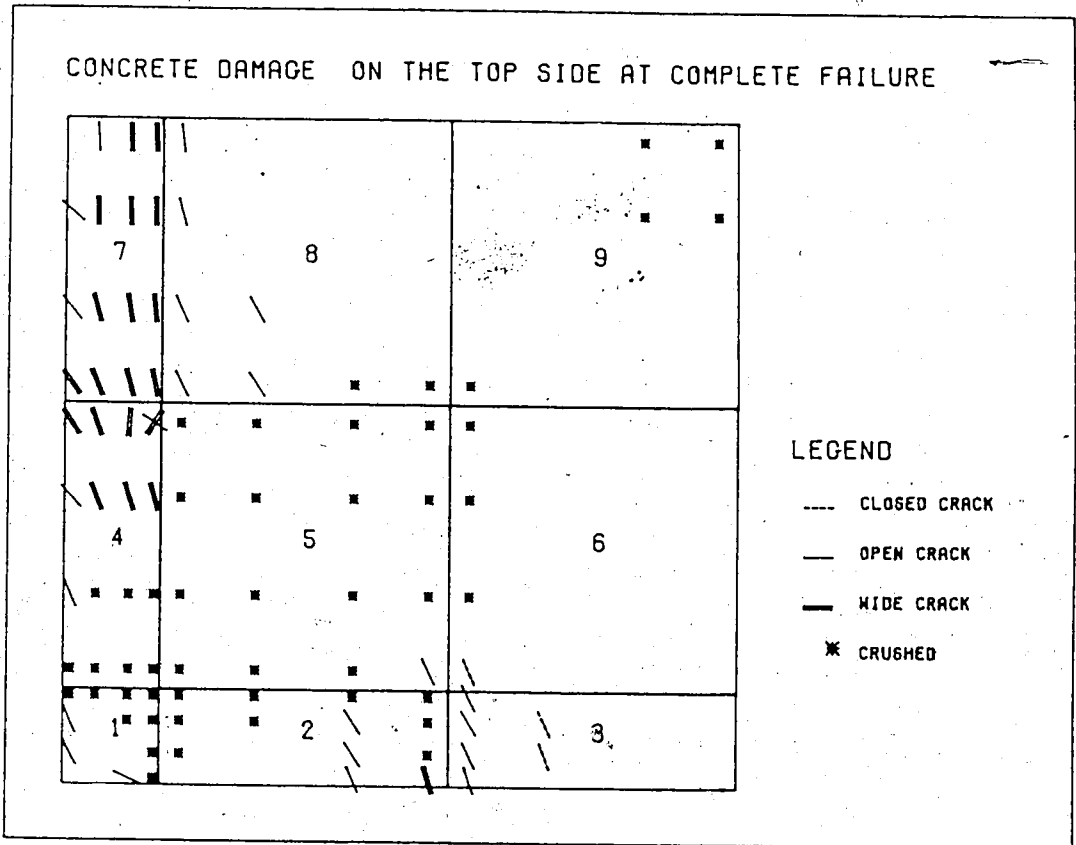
Concrete damage in Aghayere and MacGregor (1988) specimen A2 before collapse
